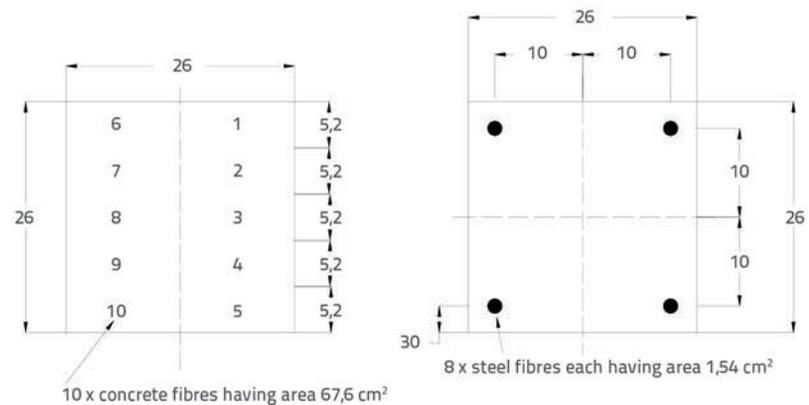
Column cross-section for second floor composed of 10 concrete fibres and 4 steel fibres (left) for concrete and (right) for steel
